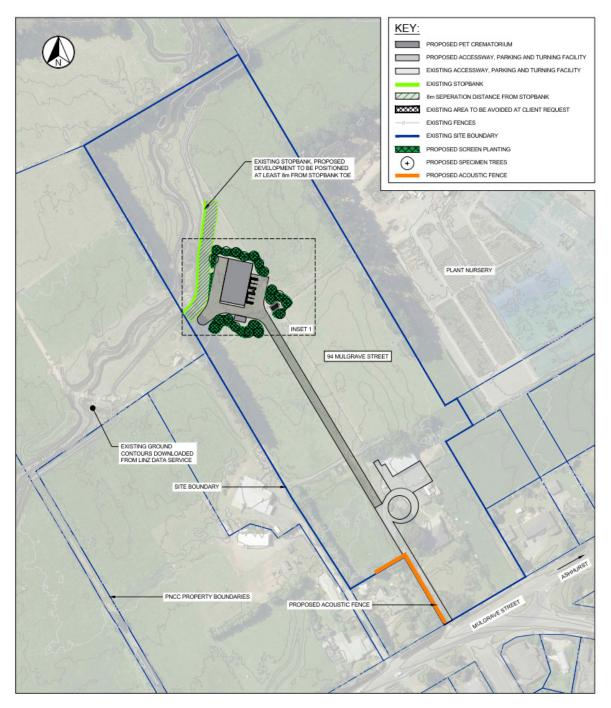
Proposed location of new Crematorium buildings onsite.
